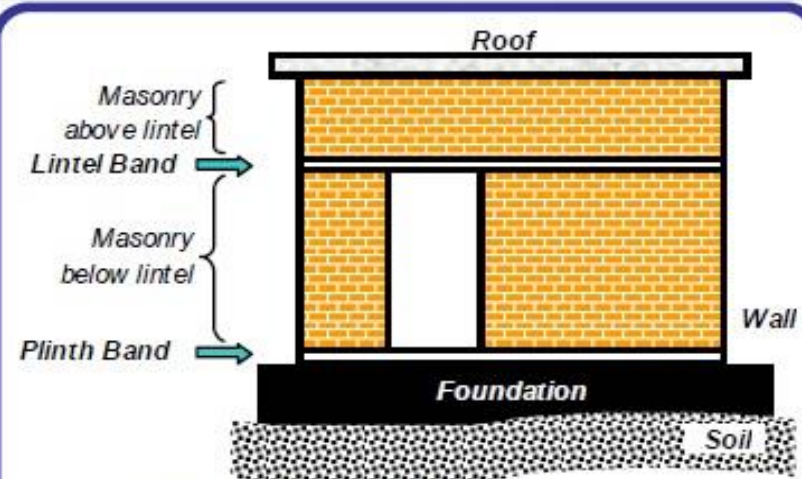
Openings weaken walls in a masonry building –a single closed horizontal band must be provided above all of them.
